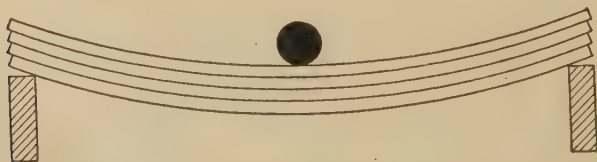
Horizontal shear between boards laid flat and bent as a beam.
